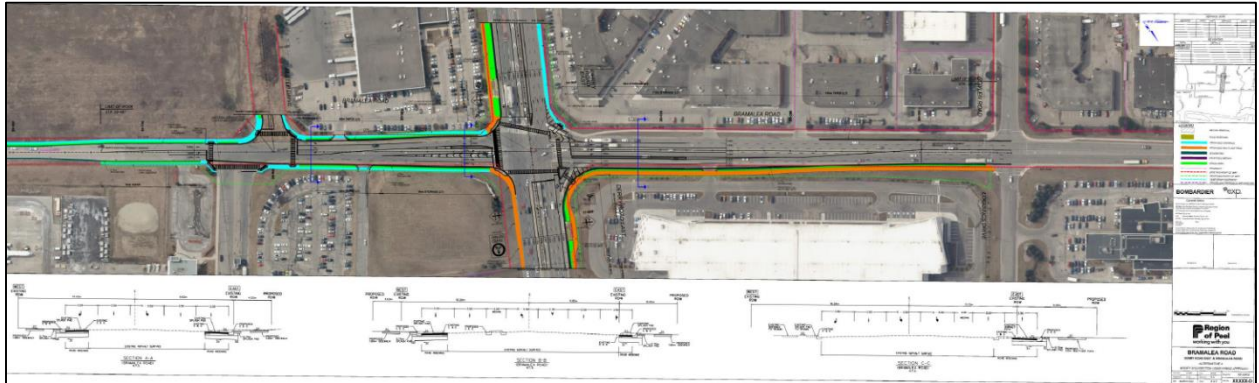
Preferred Alternative Design Concept – Derry Road East and Bramalea Road (Alternative 4)
